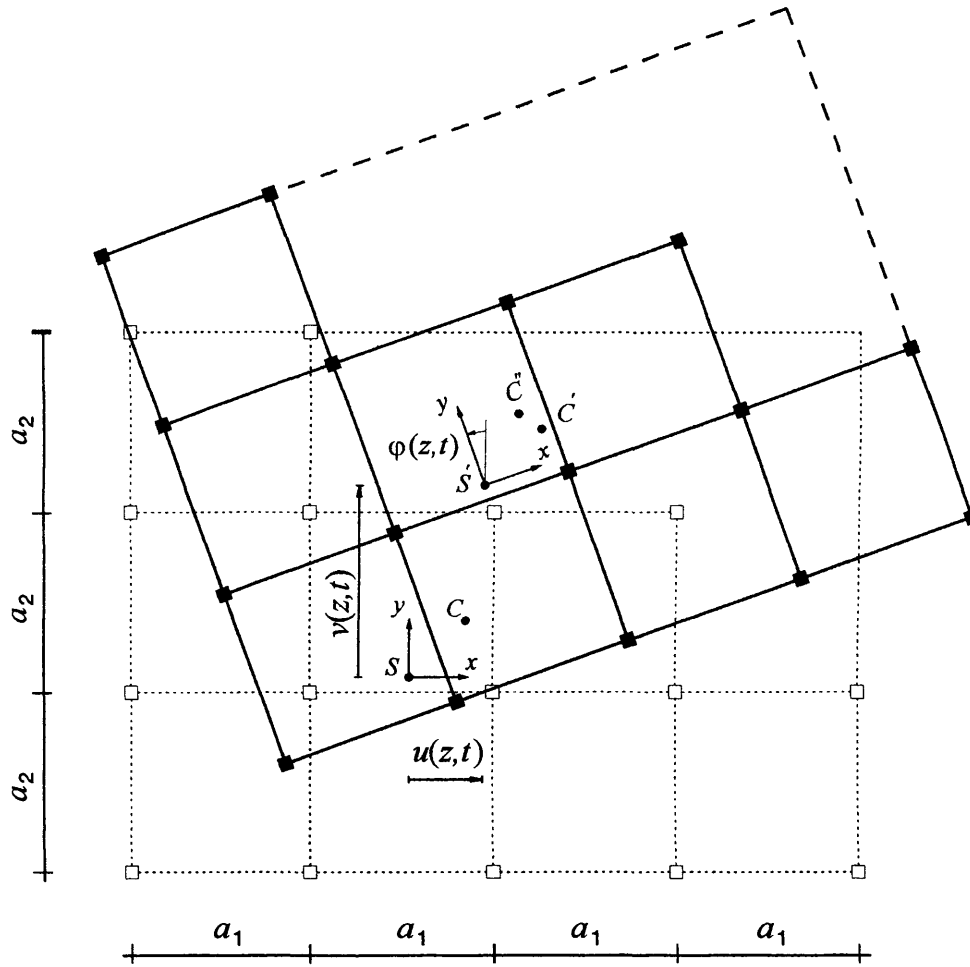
Typical floor plan of an asymmetric three-dimensional frame structure. S and C denote the locations of the shear and mass centres, respectively. The floor system  $EFGH$  is considered to be rigid in its plane.
